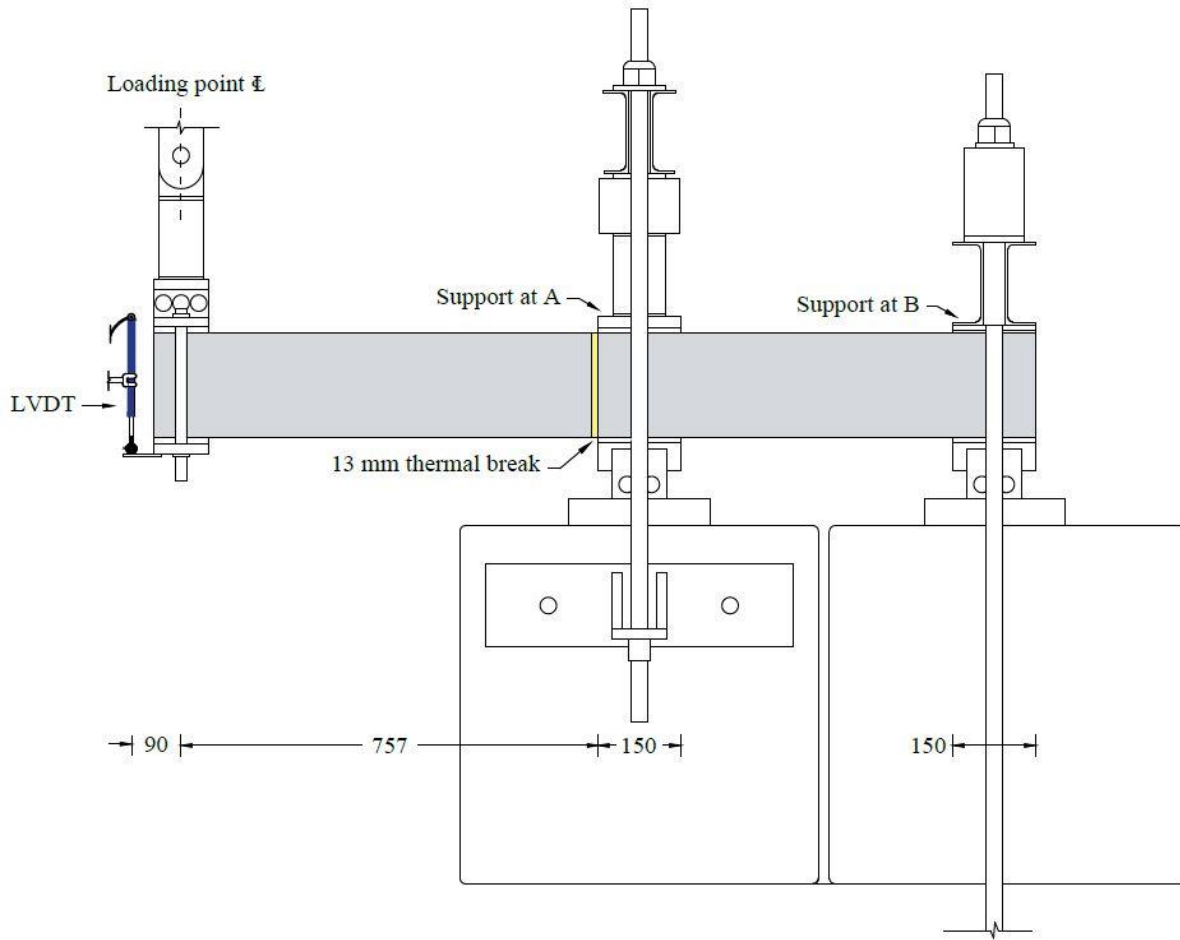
LVDT position from loading point (all dimensions are in mm)
